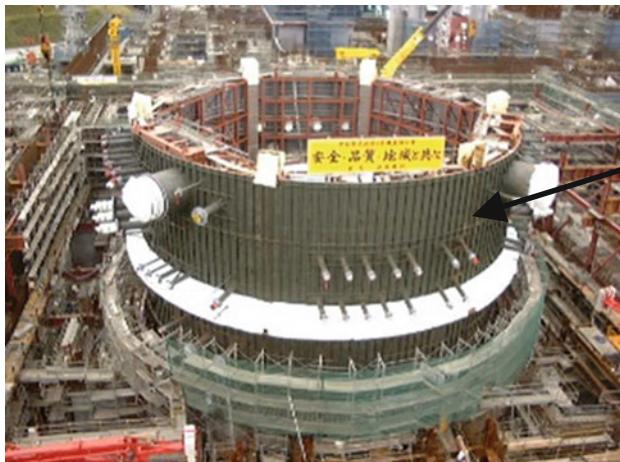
Construction of base mat concrete reinforcement bars (Photograph Chubu Electric Power Co., Inc.)
